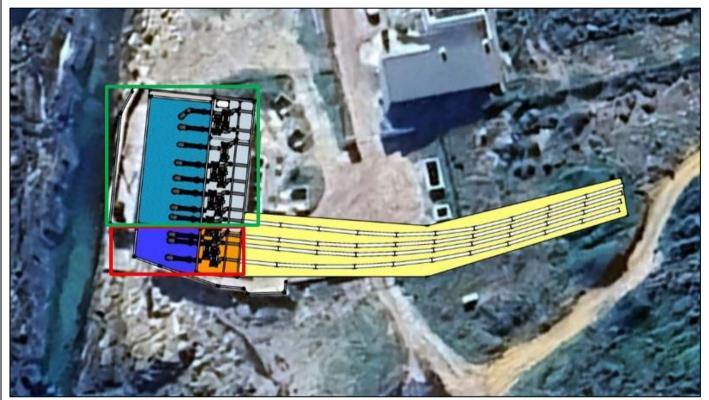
View of the existing pumphouse (green) and the area outlined in red, which is proposed for expansion to accommodate the installation of new pipelines. One pipeline will be integrated into the existing pumphouse infrastructure, as illustrated.
